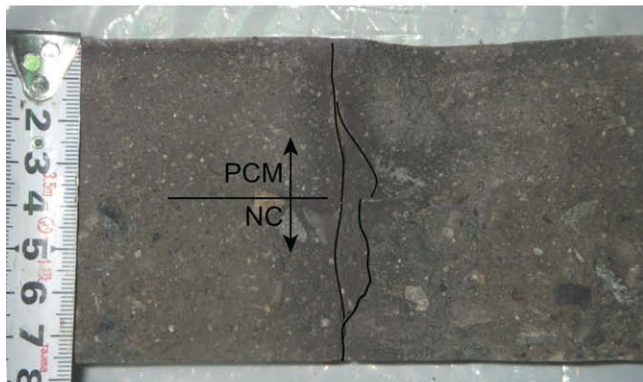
shows the crack distributions on the split surfaces of the specimens. A large crack runs transversely throughout the monolithic NC specimens and the PCM-overlaid specimens (Fig. 10c). In the HPFRCC-overlaid specimens, only one large crack was observed in the NC substrate part. At the same time, the HPFRCC layer had several fine cracks radiating from the point where the large crack in the NC substrate part reaches the interface between the substrate part and the overlaid part (Fig. 10a and b). This characteristic crack distribution was observed in both the HPFRCC surface coated and patched specimens. The high density of the cracks in HPFRCC part in the vicinity of the NC crack can be attributed to a reduced stiffness in the cross section of the substrate containing the crack as compared to other parts. Furthermore, this crack distribution proves a fine bond between HPFRCC and NC. An effect of the fiber content on the crack distributions was not observed in any type of the specimens that used HPFRCC.
